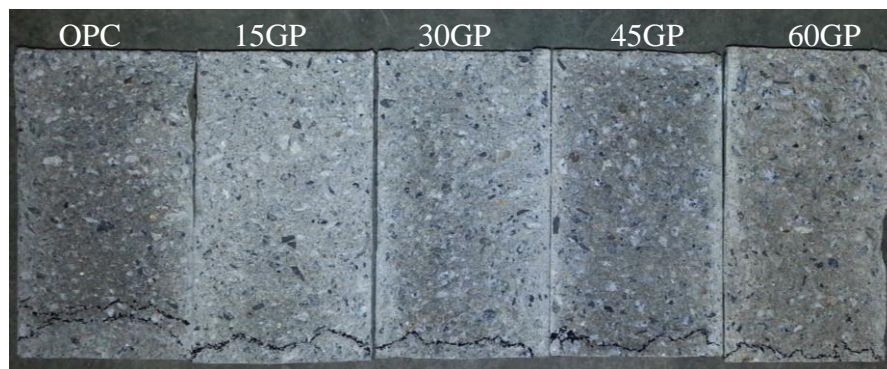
Test photos of water penetration depth into concrete containing glass powder
